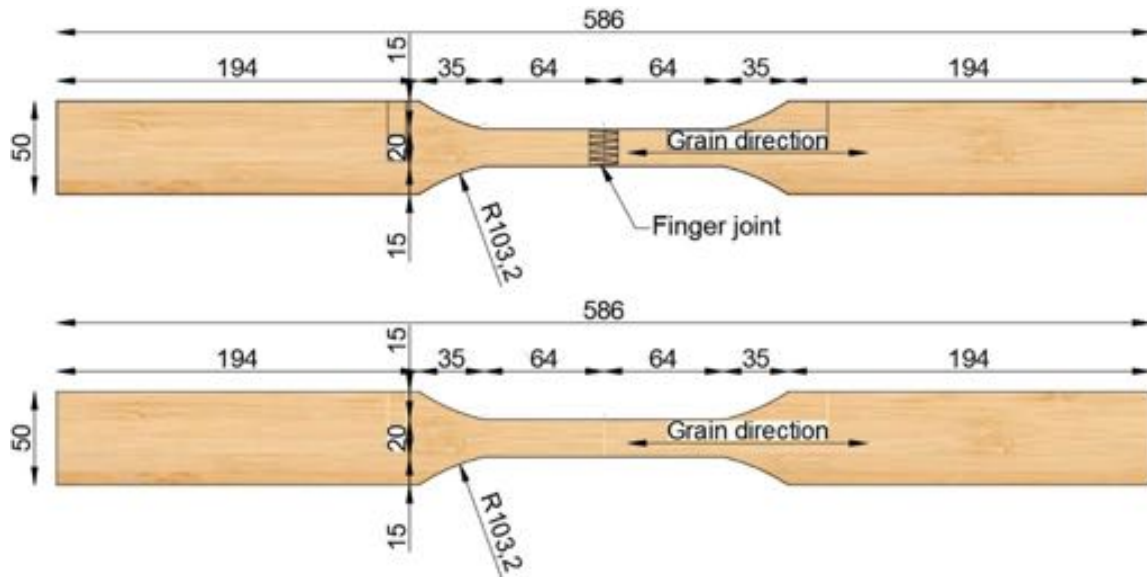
Geometry of the tensile poplar specimens with (TF) and without (TT) finger joints. Dimensions in mm.
